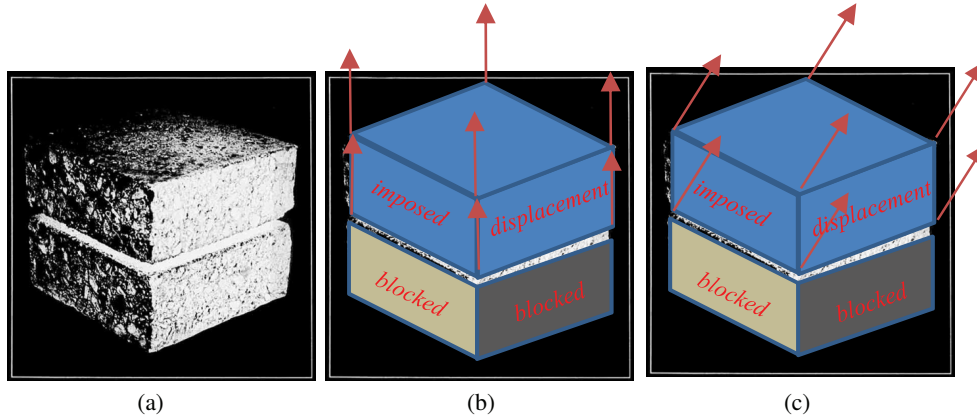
Test set-up of notched specimen performed by [Hassanzadeh \[1990\]](#): (a) concrete sample, (b) tensile load in the first part of the test and (c) mixed fracture displacements co-imposed in the second part of the experiment.
